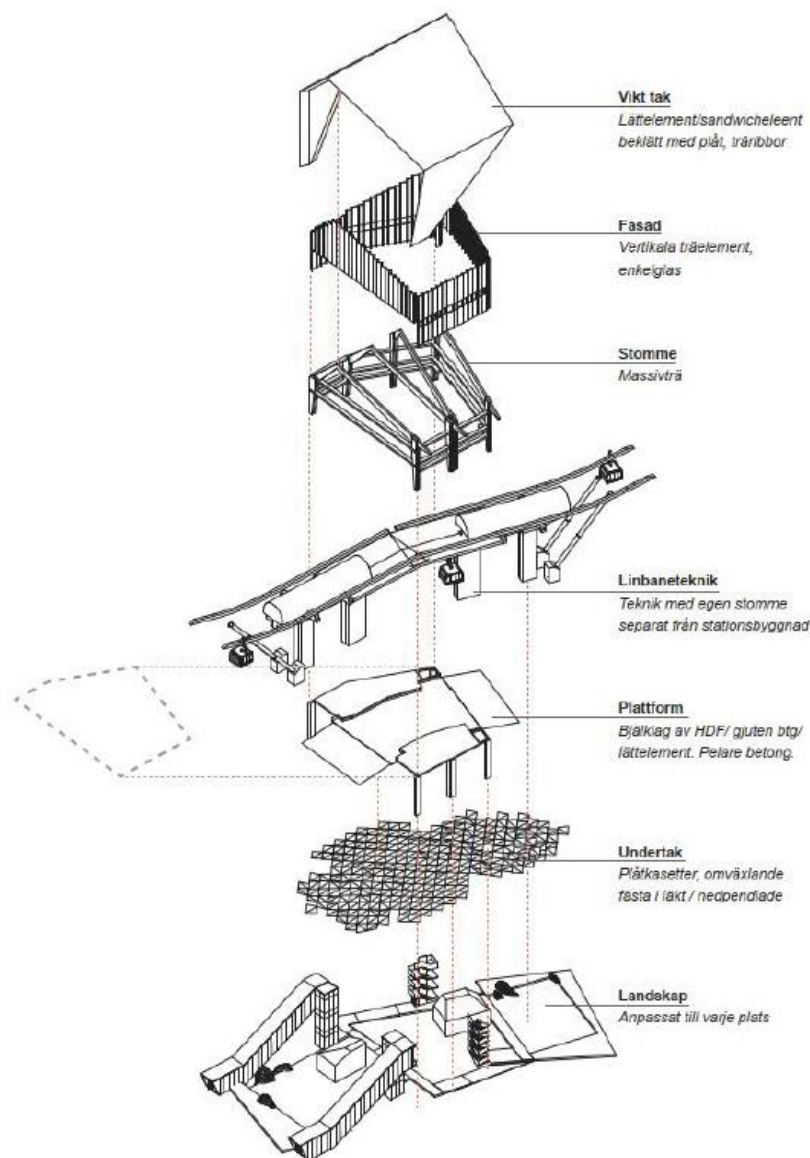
Typical design elements for the stations in design alternative 2. Source: Tyréns (2019).
